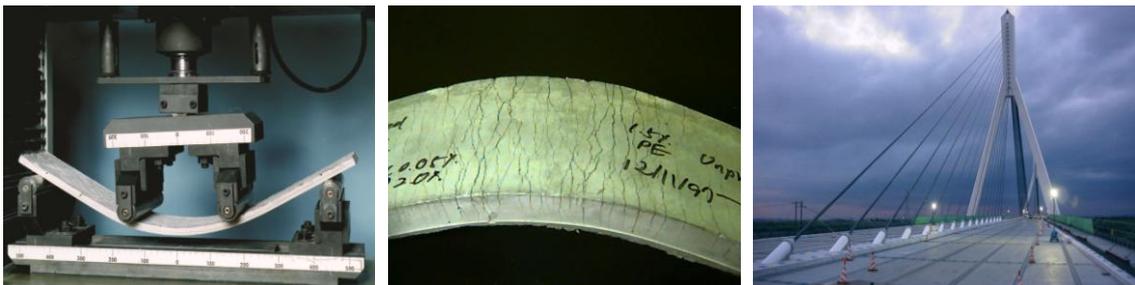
(a), 4 Point Flexural test on a concrete slab, (b) Concrete slab after flexural test (cracks formed due to bending and cured itself without any human intervention), (c) Mihara Bridge in Hokkaido, Japan.
